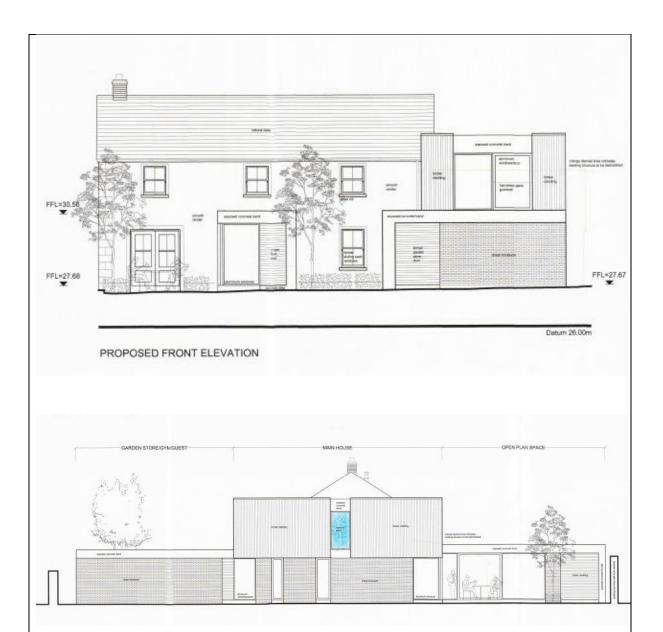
Elevations of the approved extension at number 30a Cultra Avenue showing window conditioned to be obscure glazing.
